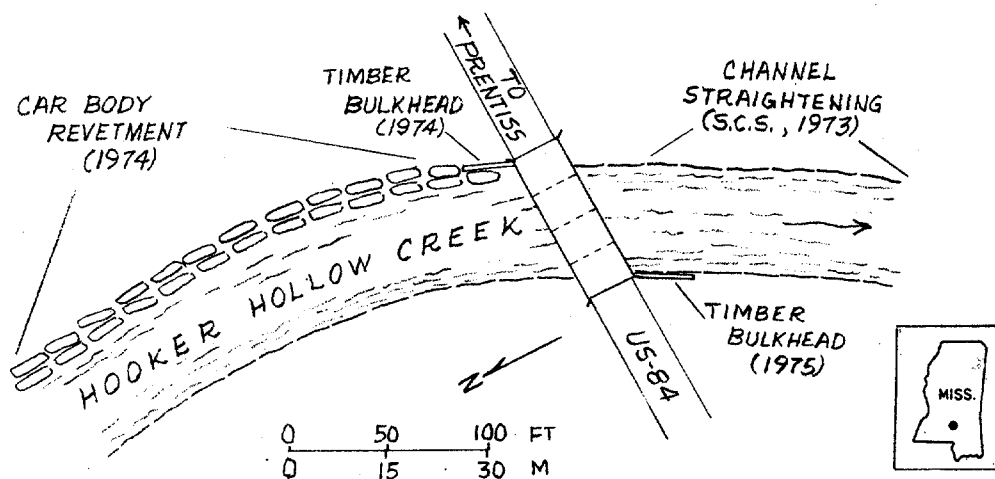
Plan sketch of Hooker Hollow Creek at US-84 crossing.
